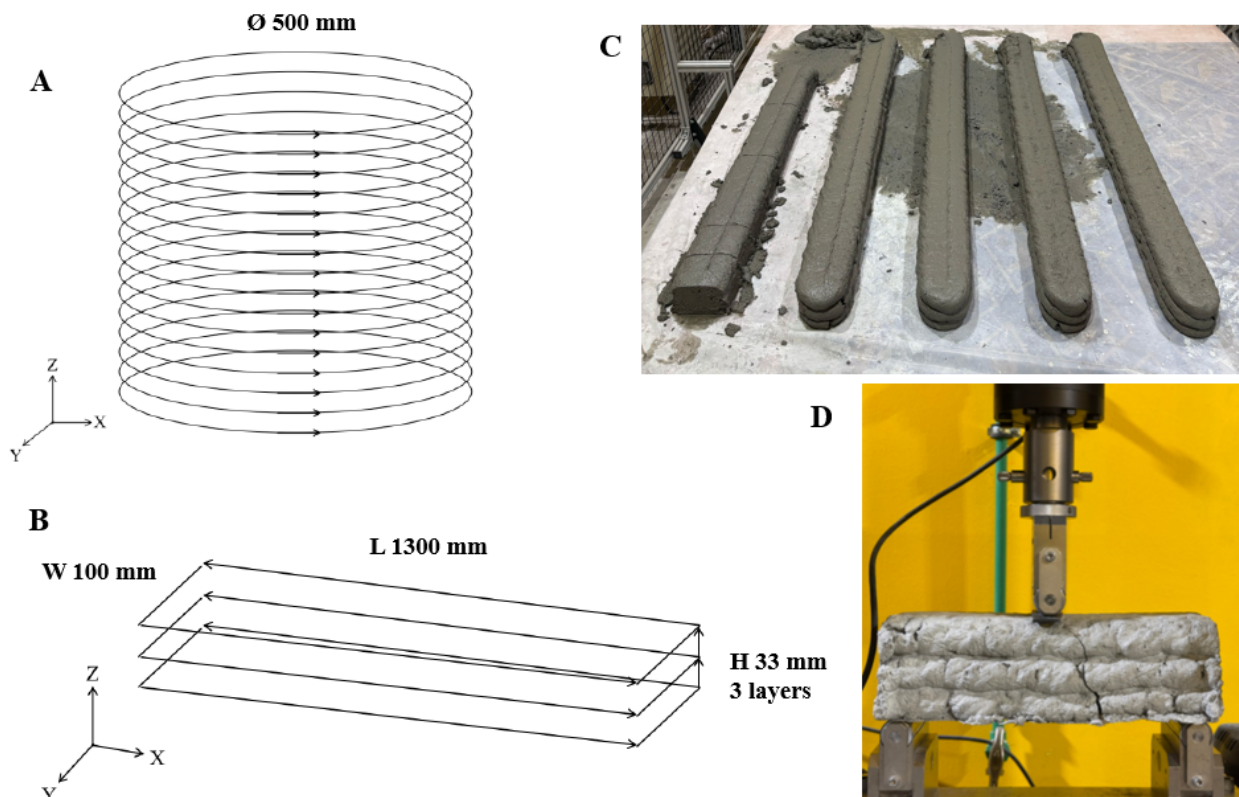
Tool paths and 3D-printed samples for mechanical and buildability tests. (A) Buildability tool path; (B) mechanical testing tool path; (C) printed beam samples; and (D) beam samples under flexural testing.
